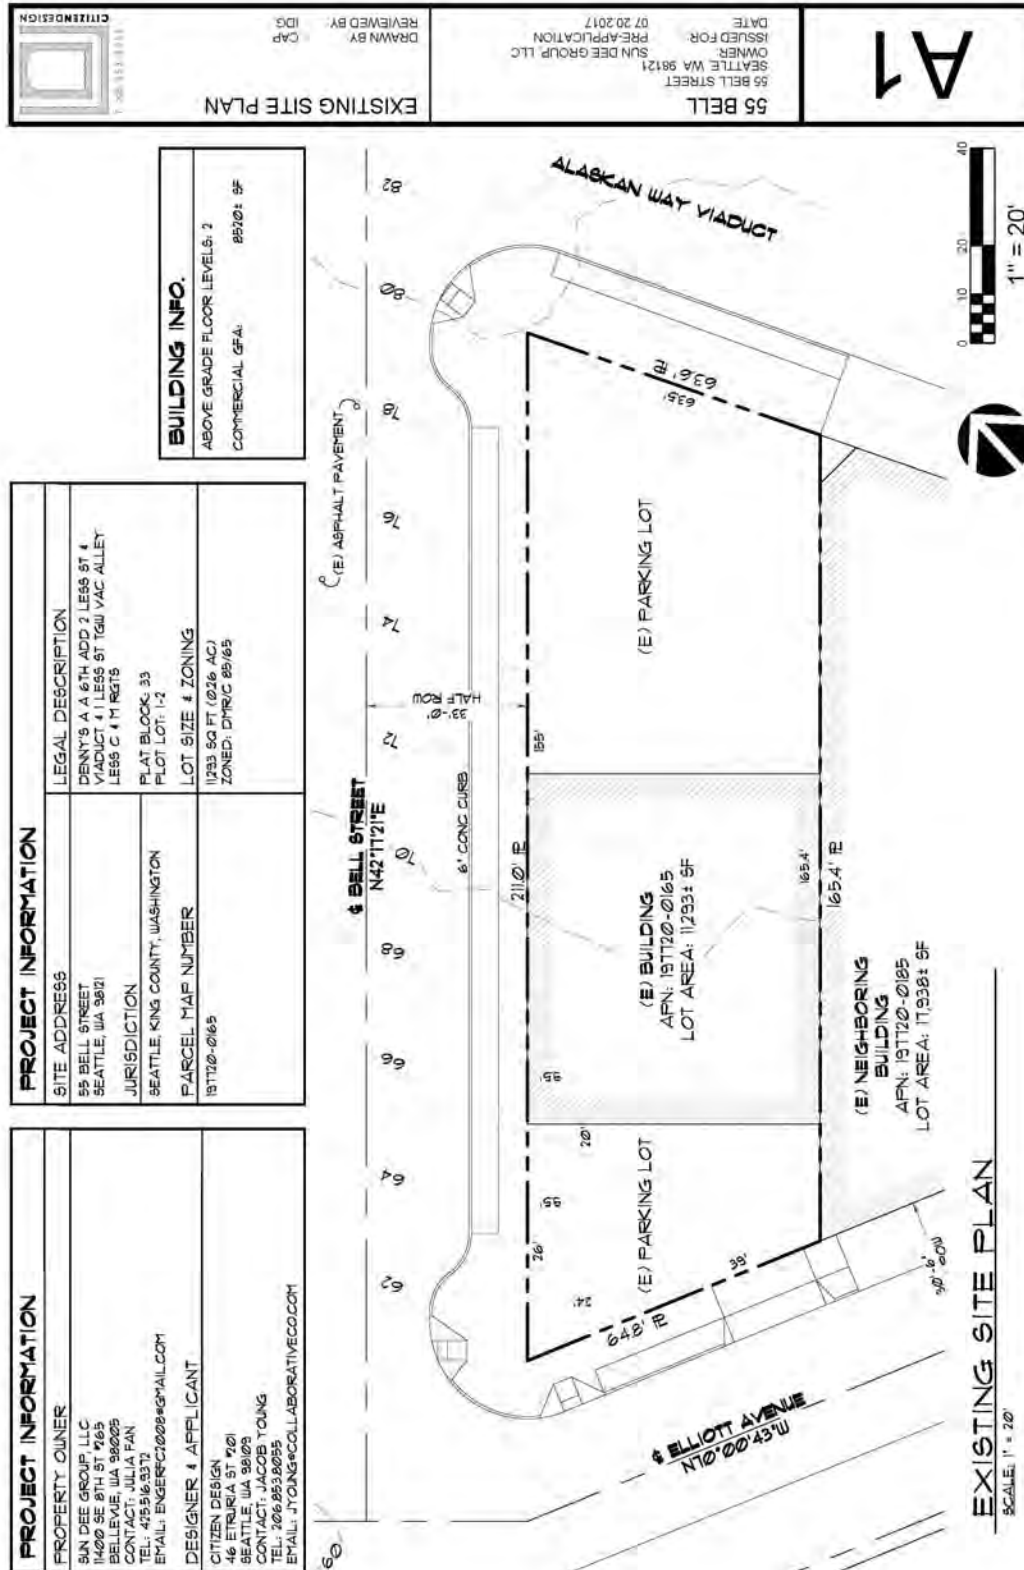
Above, existing site plan, by Citizen Design (June 2, 2017).
